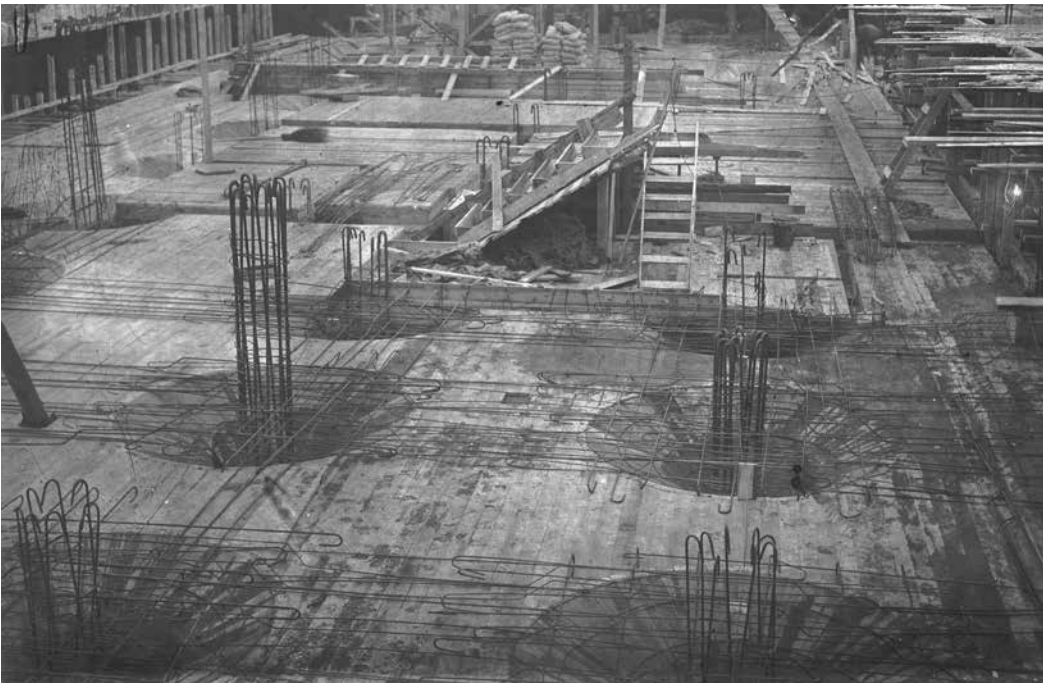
Casting the beamless reinforced concrete ceiling of the Turun Sanomat Newspaper Building. TS.
